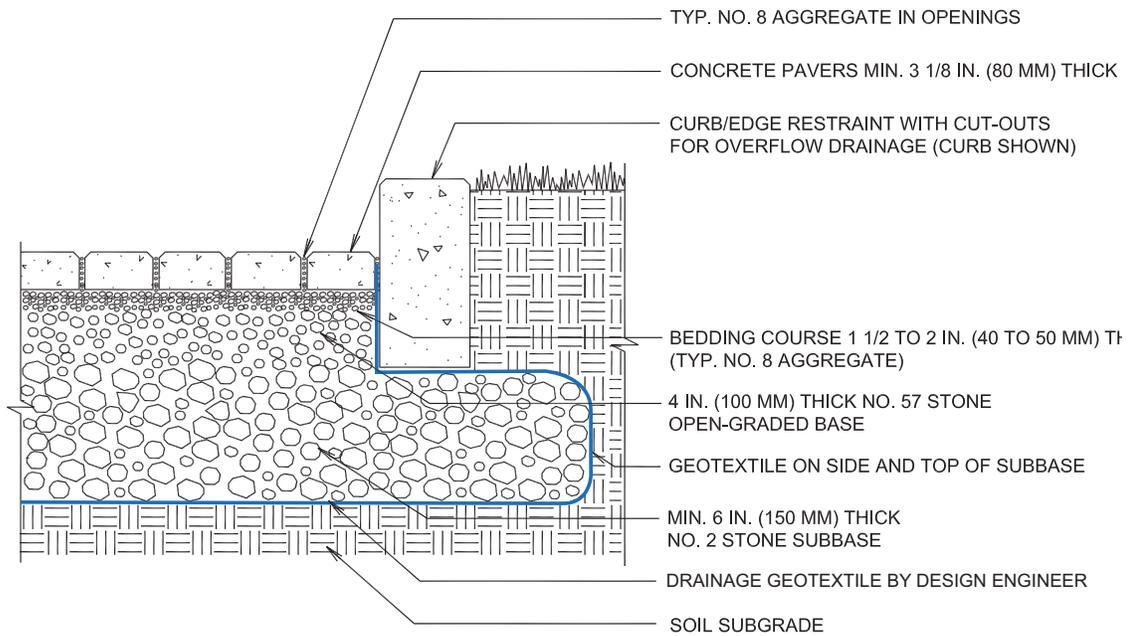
Permeable Interlocking Concrete Pavement geotextile locations
